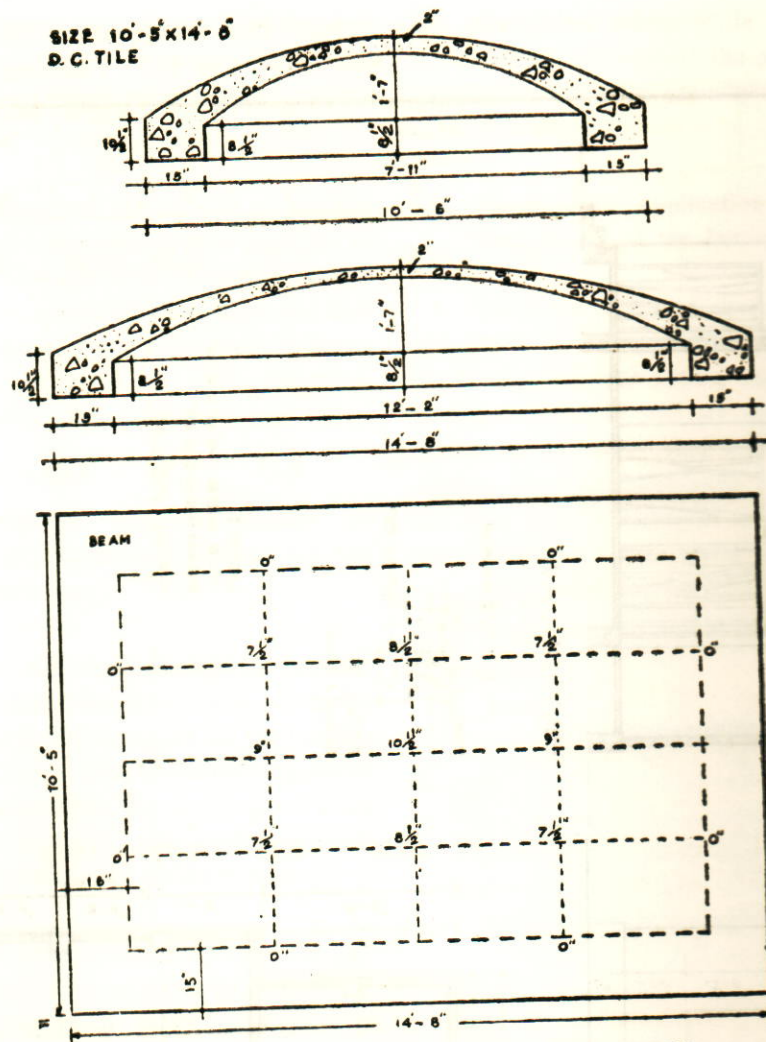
Plan and Section of shell roof (10'-5" x 14'-8")
